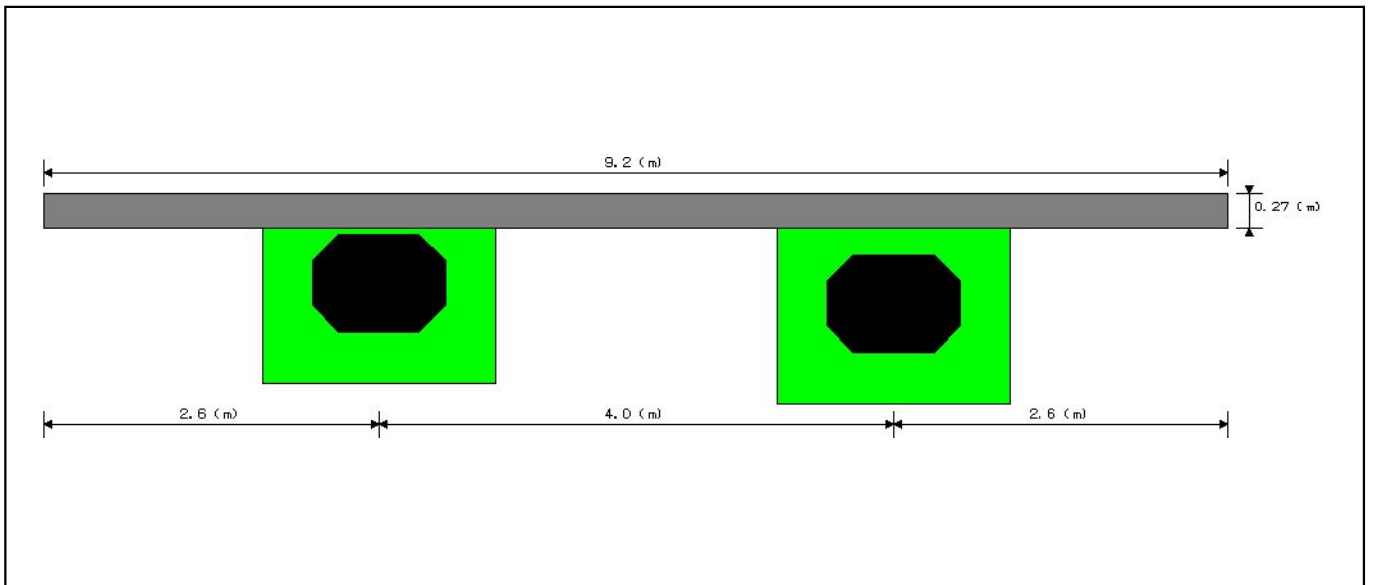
Down station view for girder layout in Span13 - Station 0.0 .
